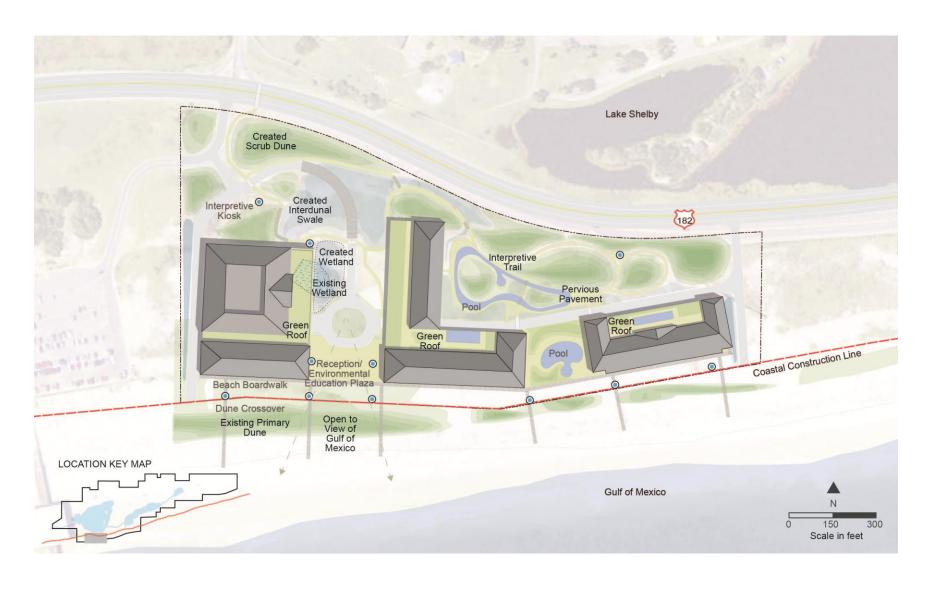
Gulf State Park Lodge and Conference Center preliminary design — conceptual site plan.
